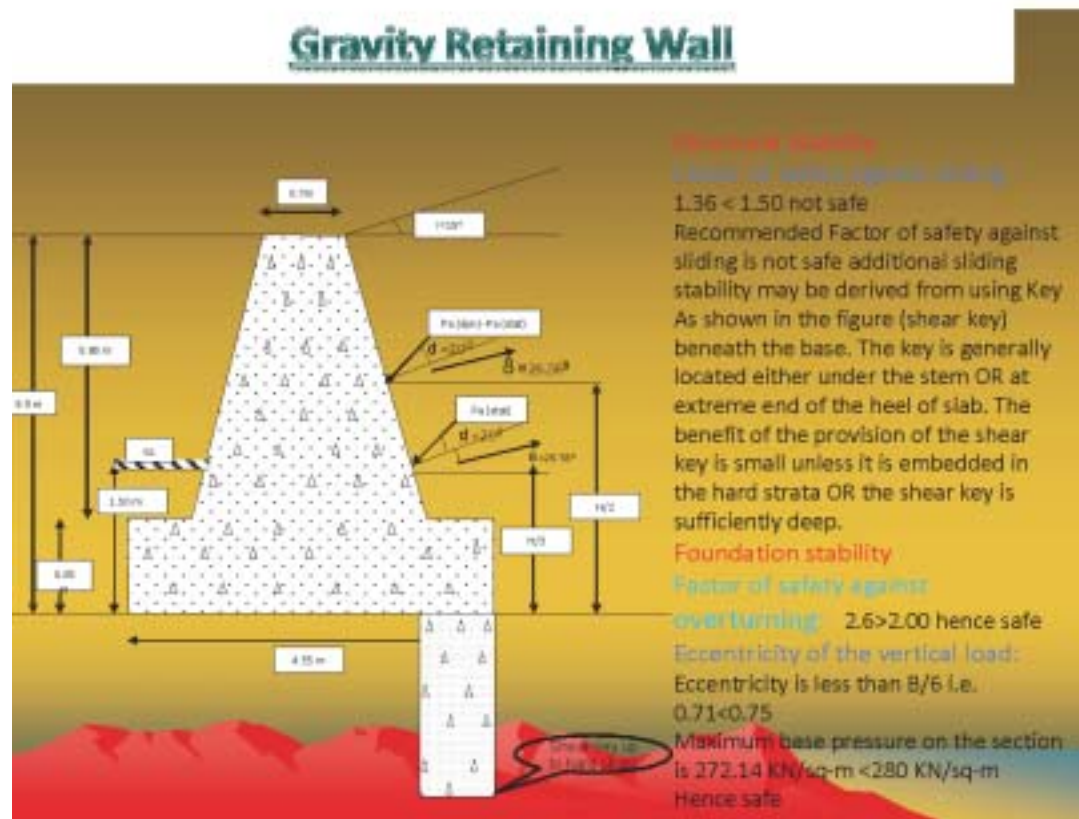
Proposed design for a Gravity Retaining Wall based on Factor of Safety
